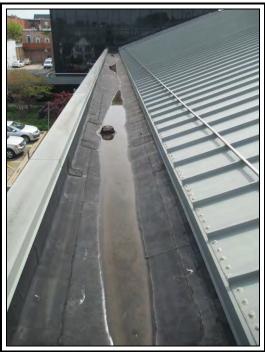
Looking east across Roof Area 11: Fully adhered EPDM.
